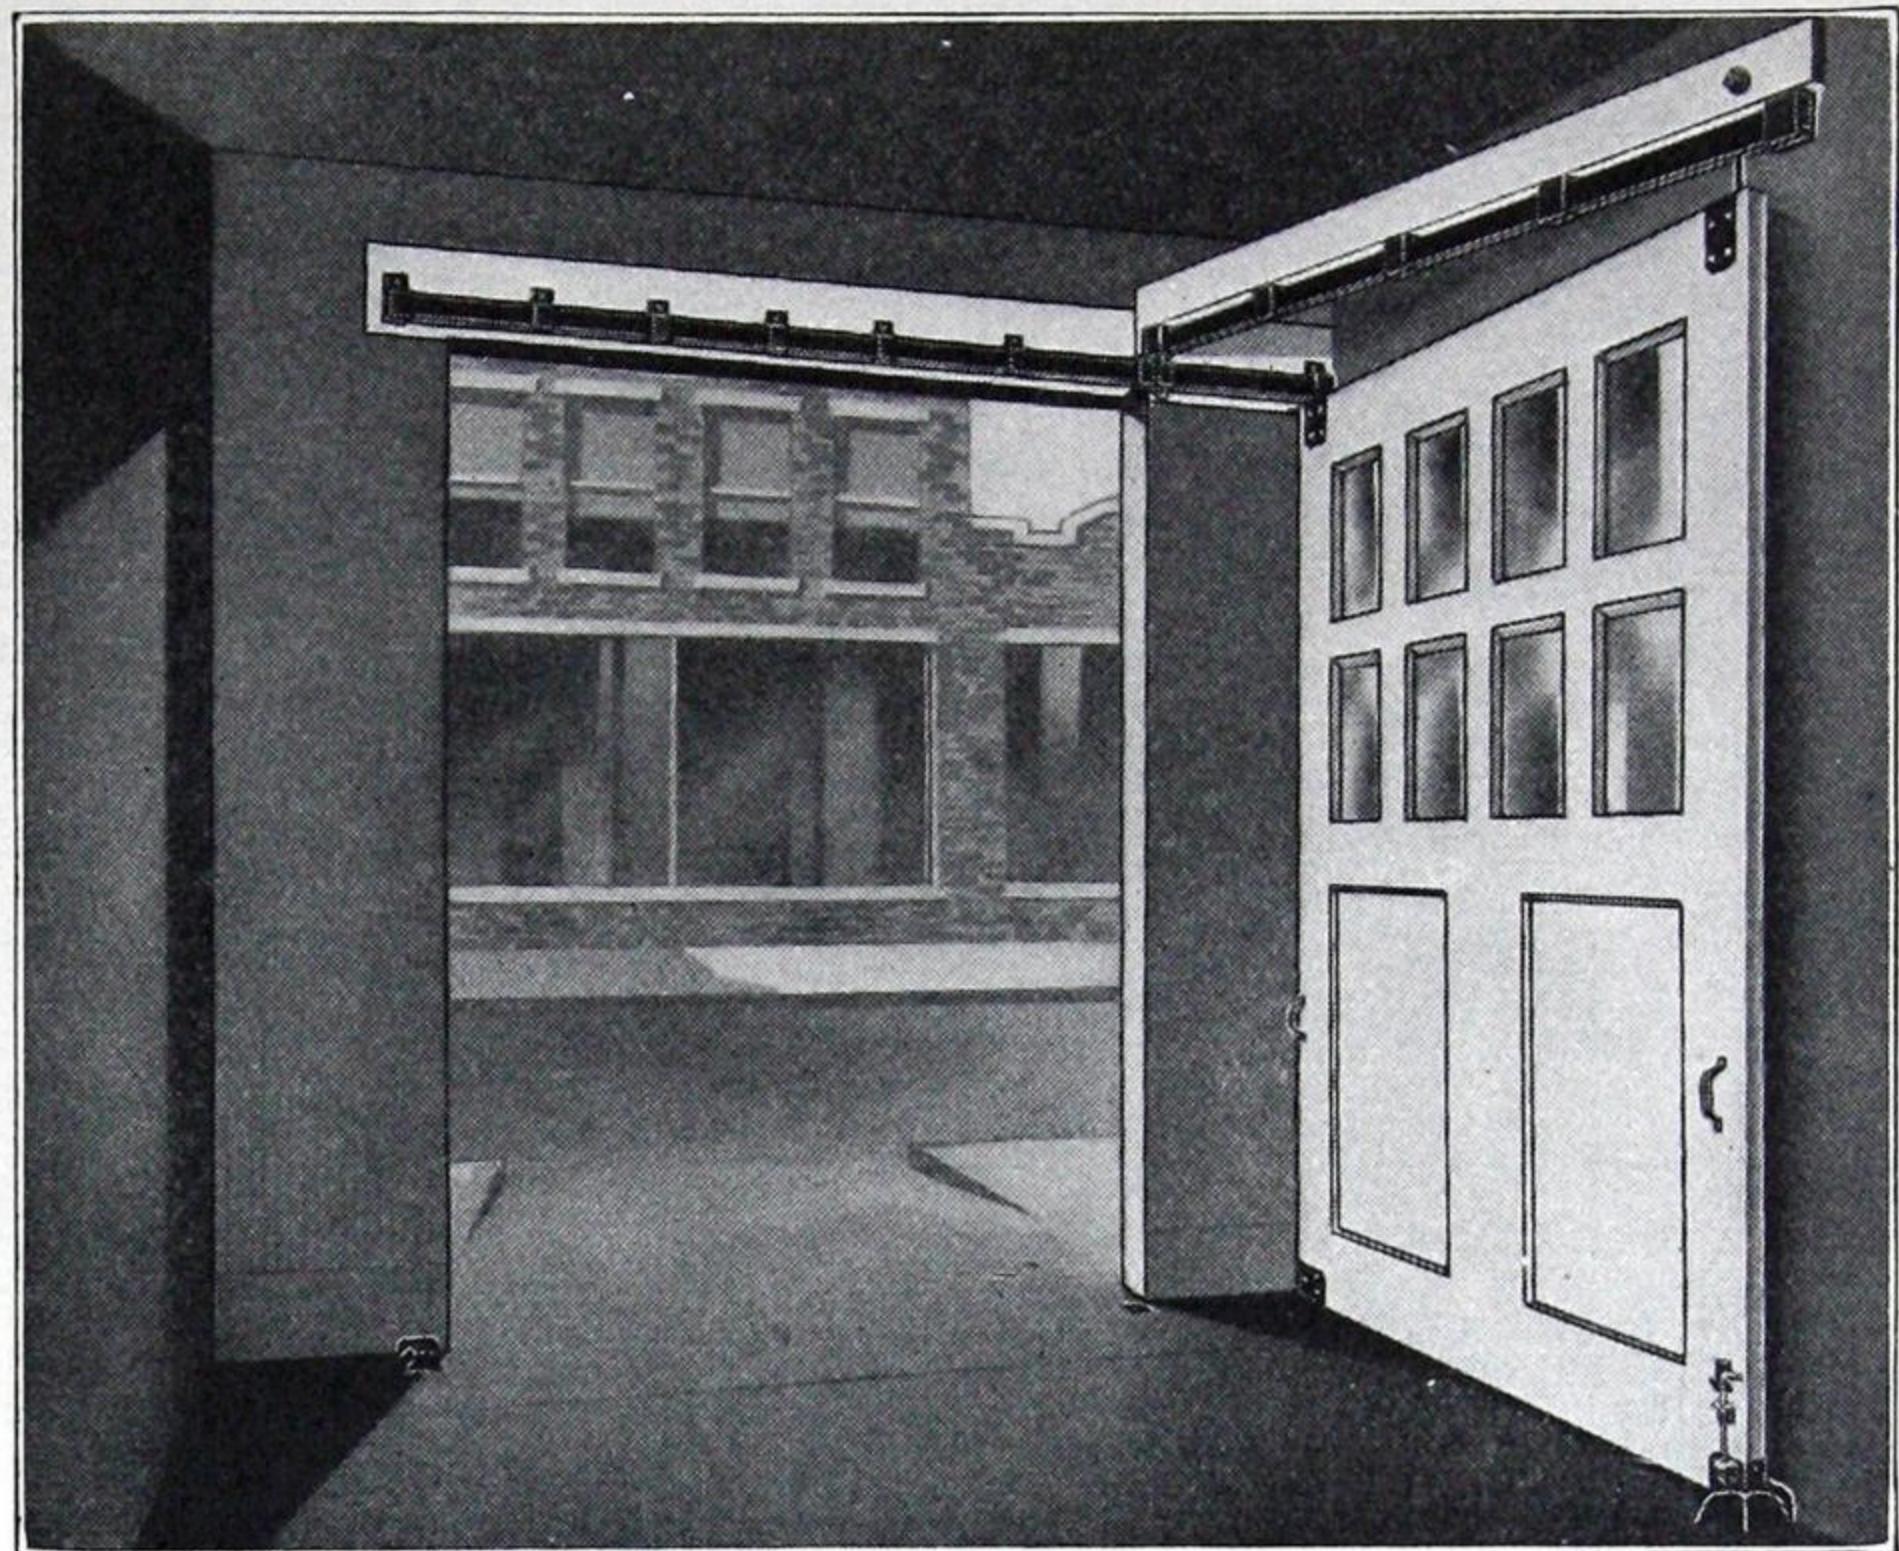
Interior View. Door Wide Open and Parallel with Side Wall.
